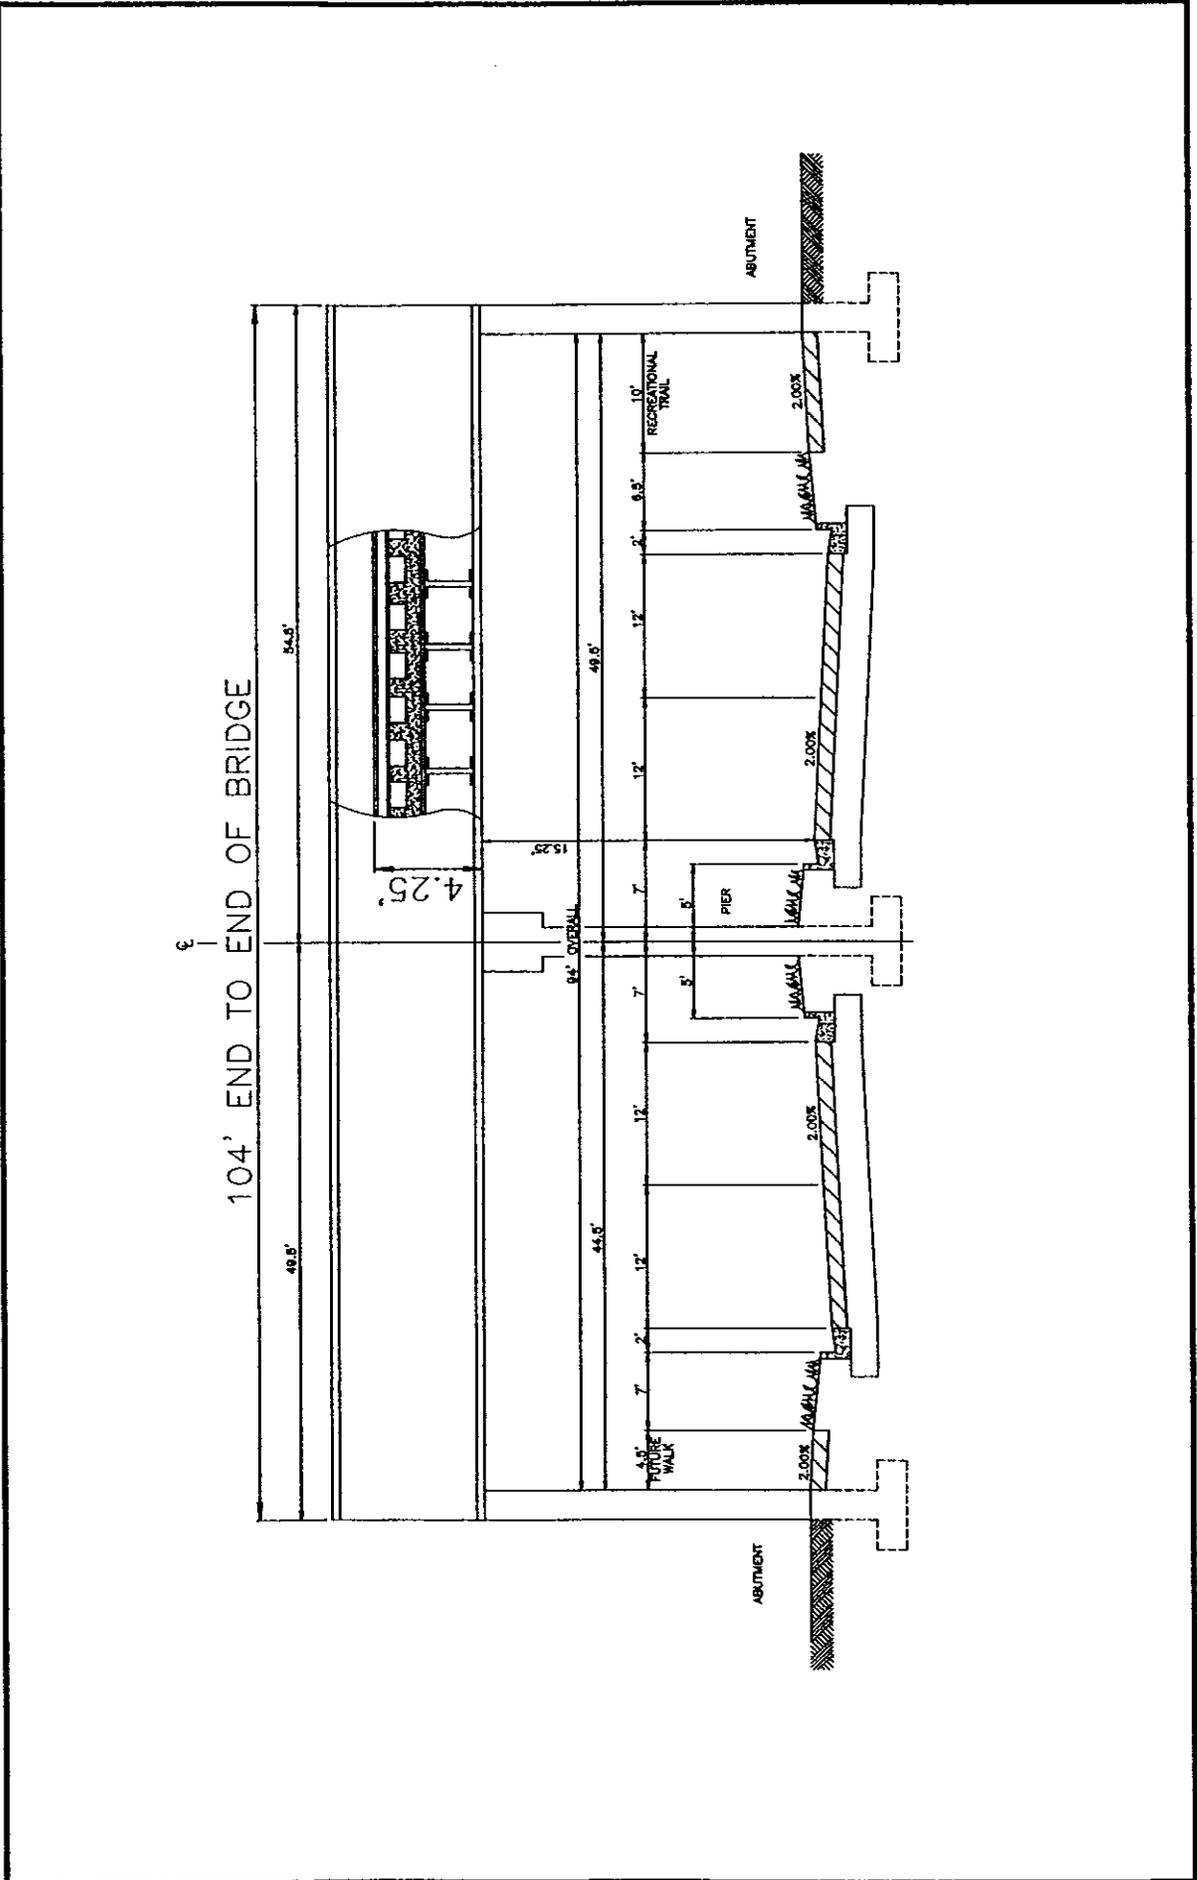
2-SPAN THRU PLATE GIRDER BRIDGE WITH RETAINING WALLS
